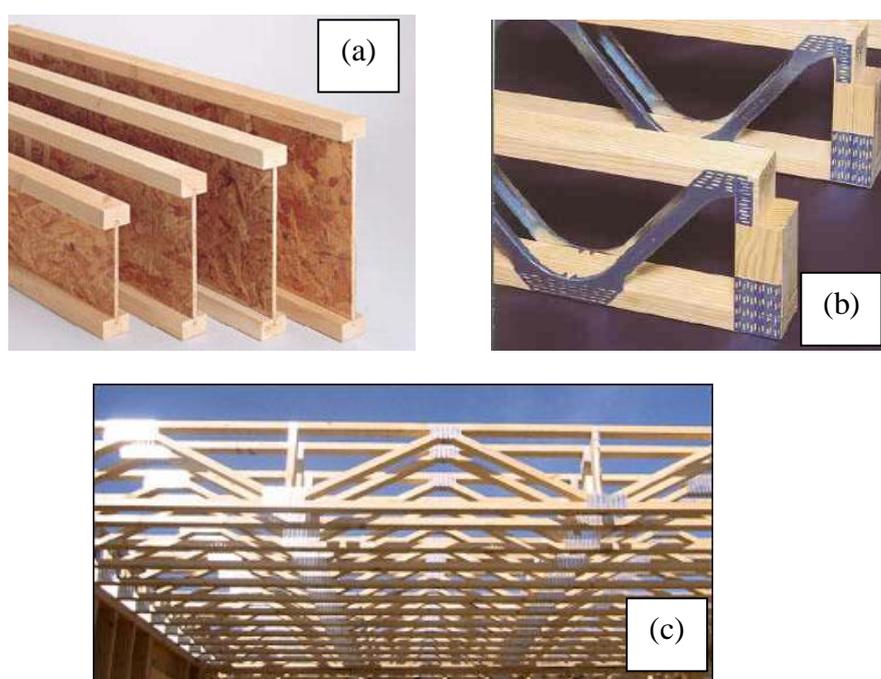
Engineered floor joists (a) I-Joists (b) Truss steel web (c) Truss girders
